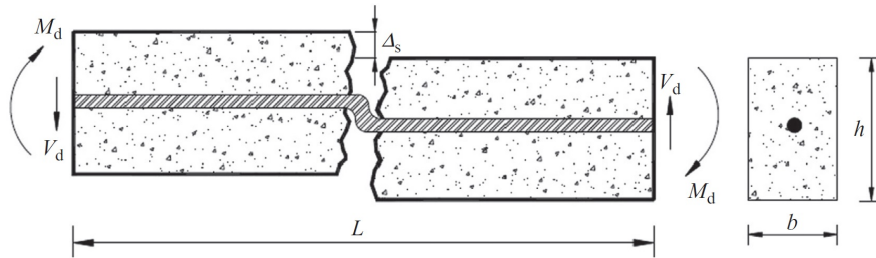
Dowel action of the longitudinal reinforcement in concrete [34]
